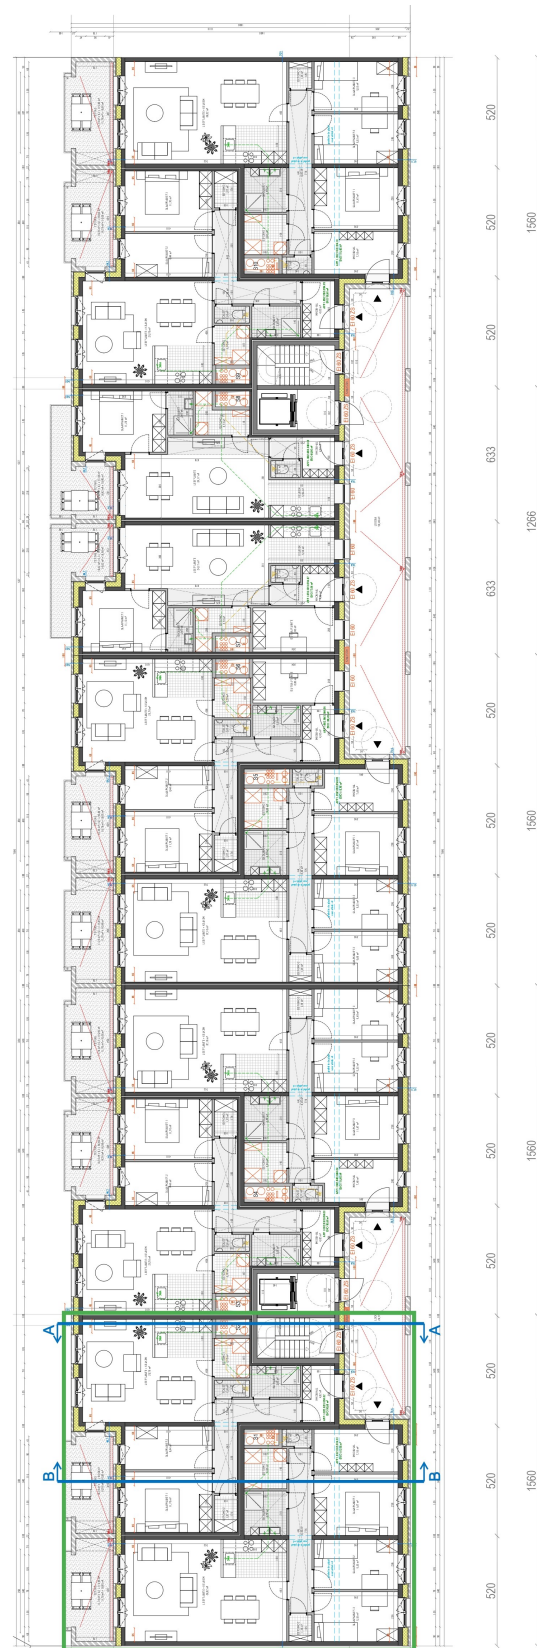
Plan of floor 1 to 4 of the case study building with indication of the functional unit (green) and sections (blue)
